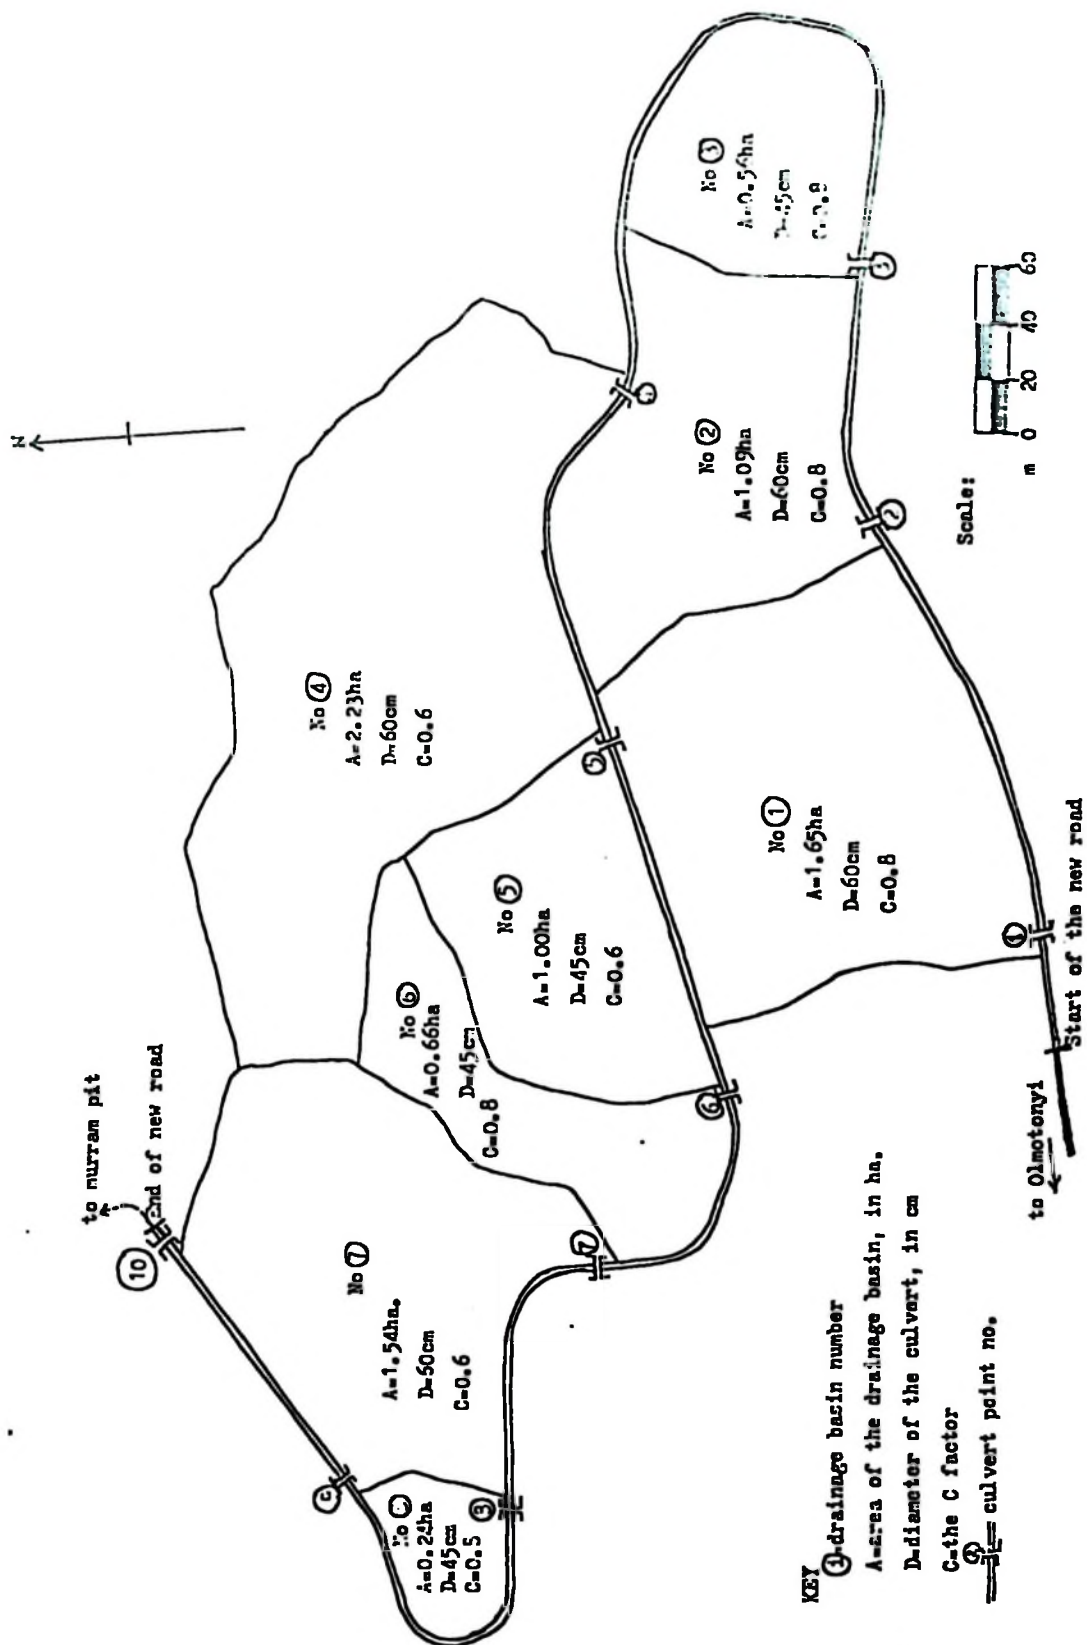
The drainage basins and the positions of the culvert points on the new road.
